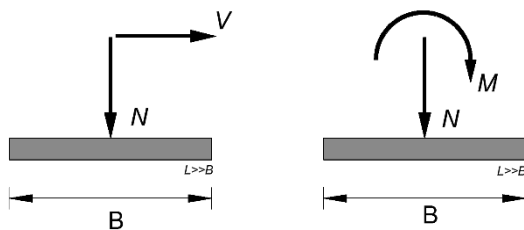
Shallow strip foundation under eccentric and inclined loading.
